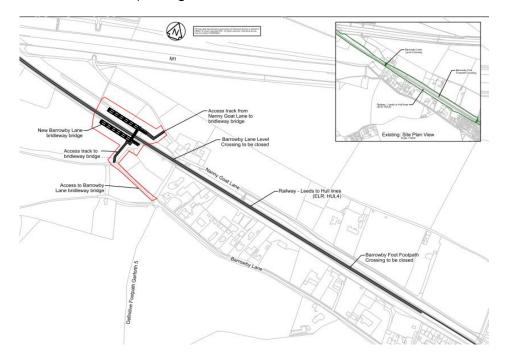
Site layout plan of the New Barrowby Lane Bridge
